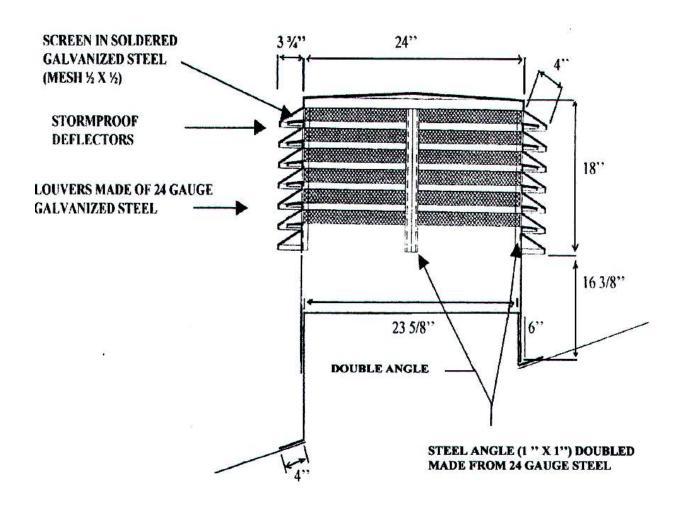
# DETAIL DRAWINGS (CONT.) ROOF VENTILATOR #301 (22 x 22)
